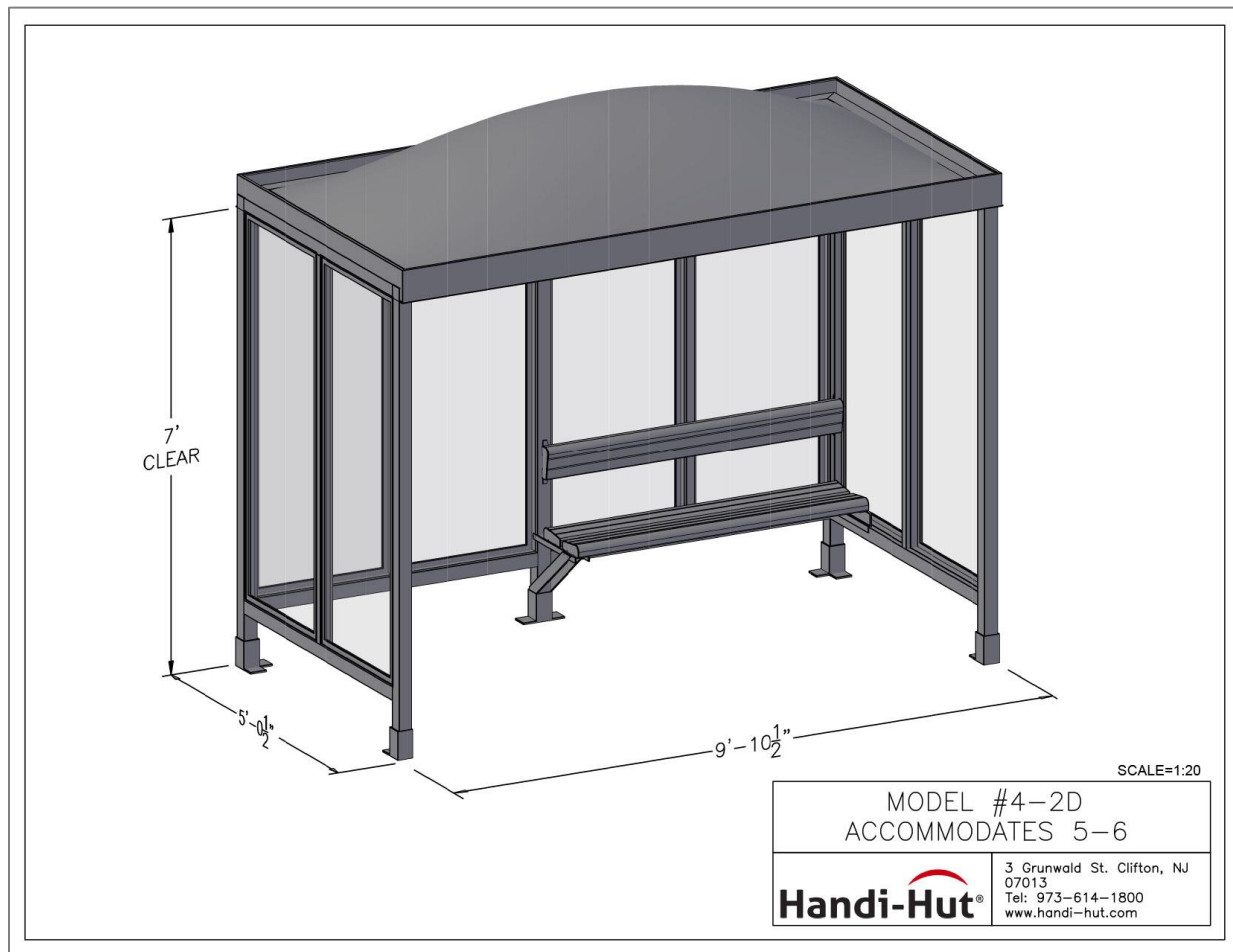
Handi-Hut® Model #4-2D Dome Roof Passenger Shelter
